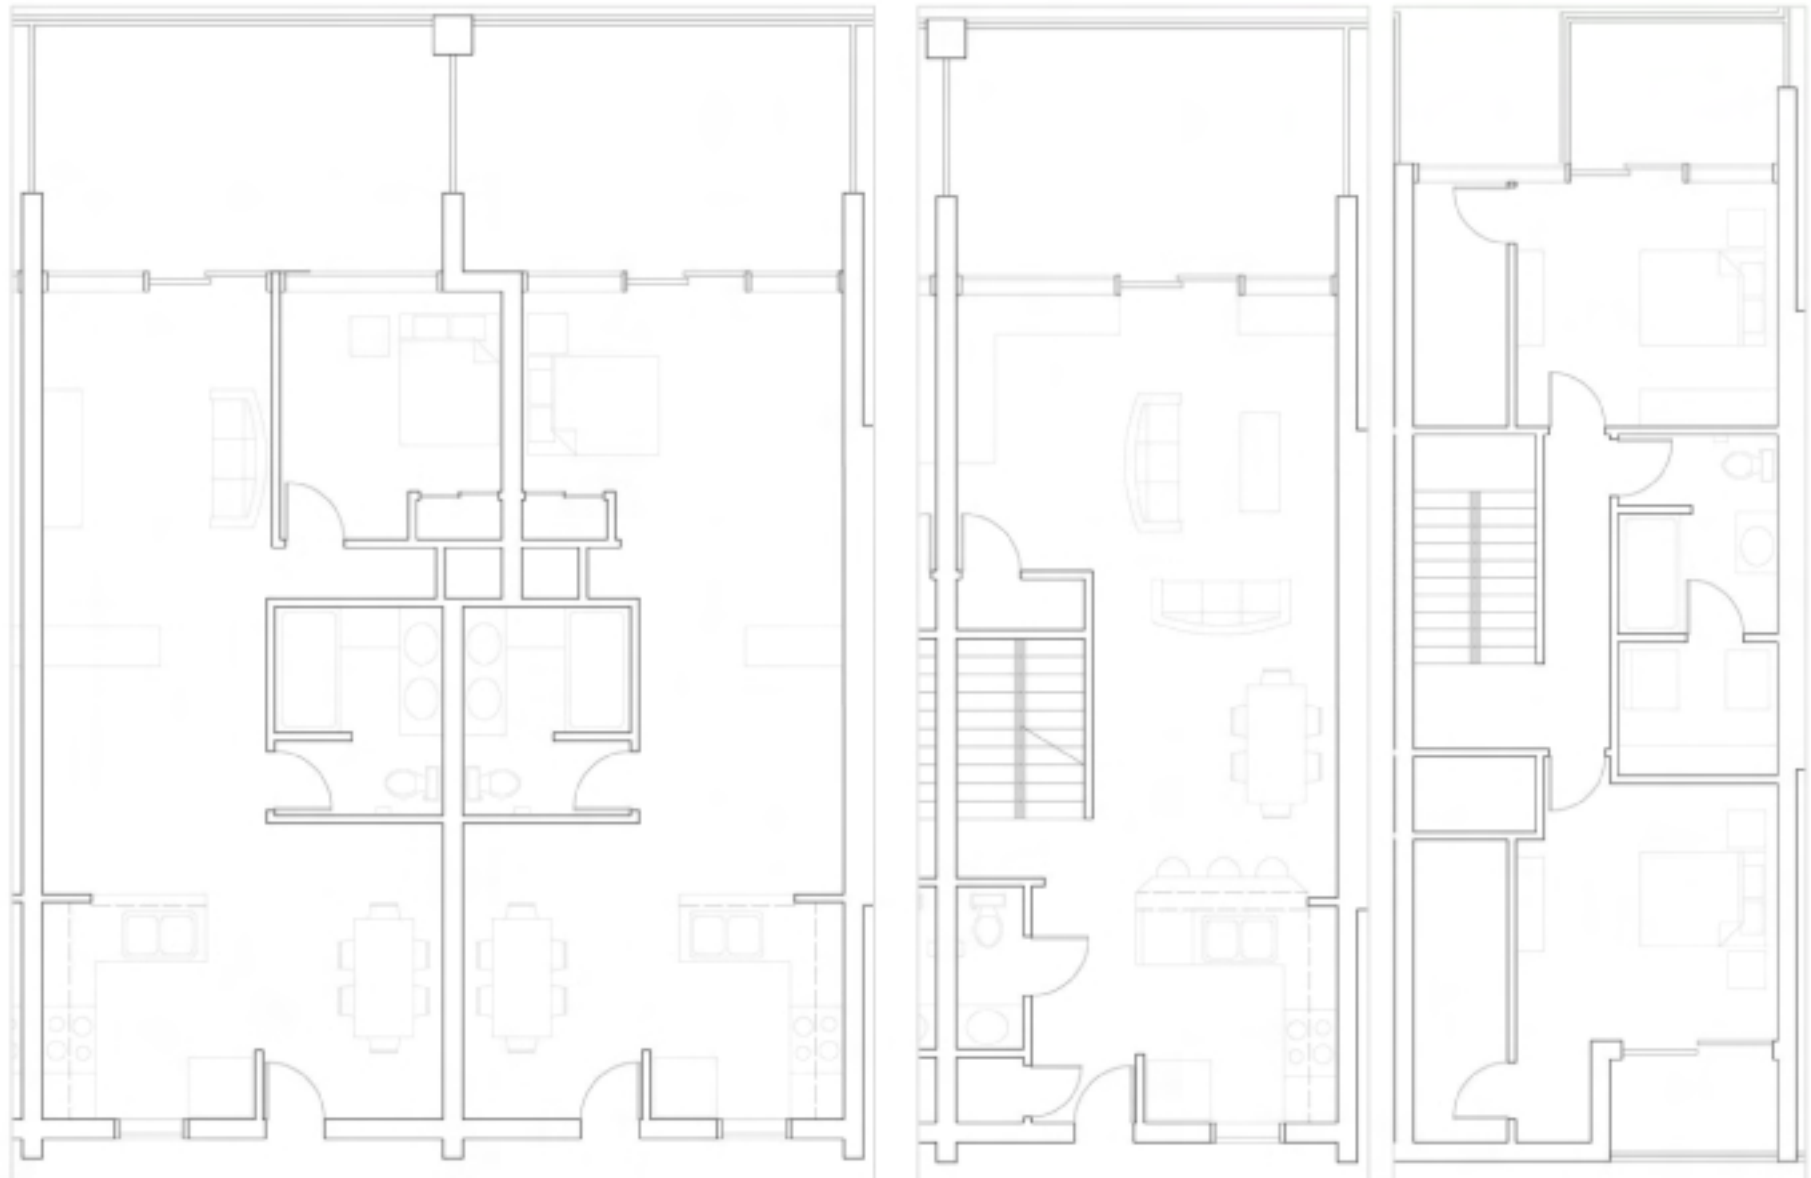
Larger scale housing units. From left to right: one bedroom unit, studio unit, first floor duplex, second floor duplex (two bedrooms) [AutoCAD]
